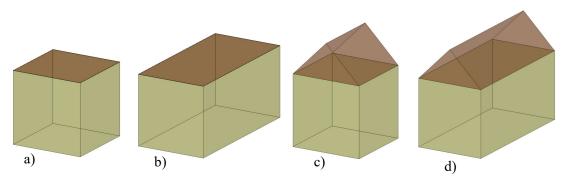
a) 1x1 m with flat roof b) 1x2 m with flat roof c) 1x1 m with inclined roof d) 1x2 m with inclined roof.
